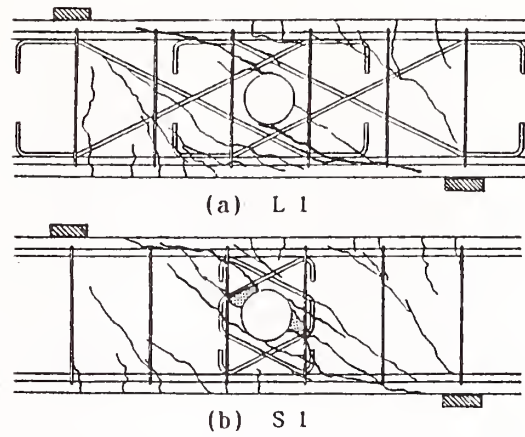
Crack pattern of Specimens (at Maximum Horizontal Force)
